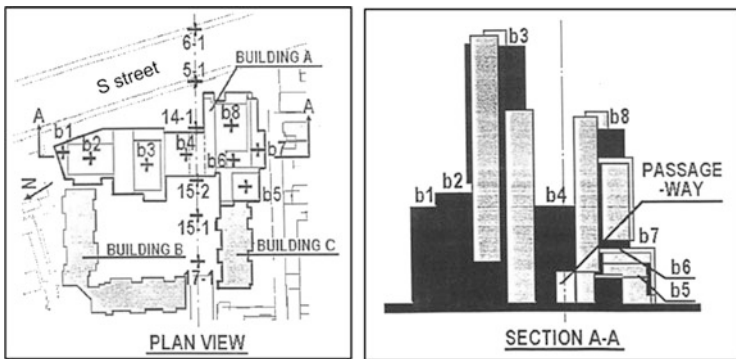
Plan and elevation view of proposed development showing measurement locations near and on buildings
